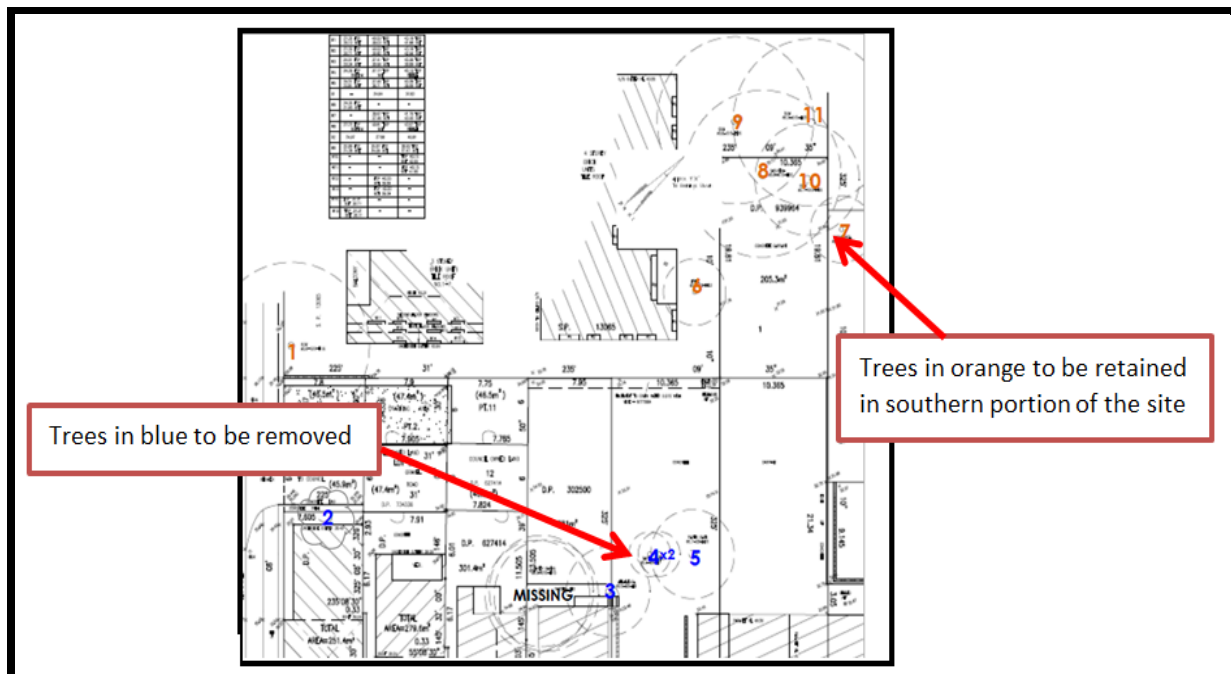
Tree Removal and Retention Plan (Source: Arborist's report, November 2019)
